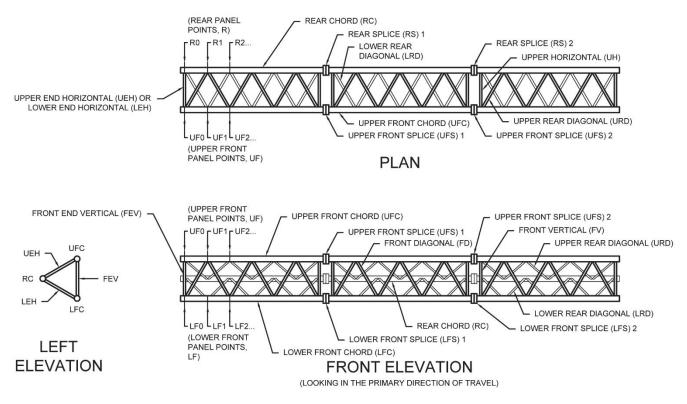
Methodology for Panel Point Numbering and Component Labeling of Tri-Chord Truss Sign Structures with Splices
